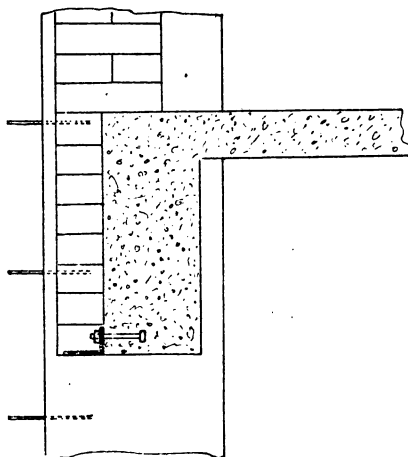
Detail showing Brick Anchoring of Brick Facing to Concrete Lintels and Columns.
